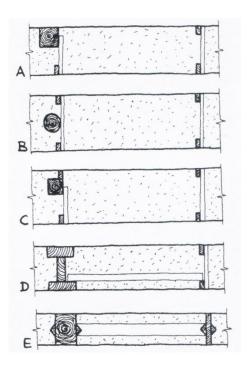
Horizontal sections with various timber frames for LWL construction (Gaia Architects, 2003).
